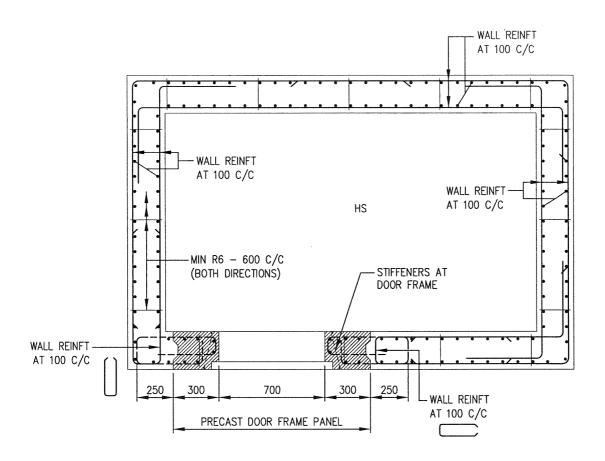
(j) DETAILS OF PRECAST HS DOOR
